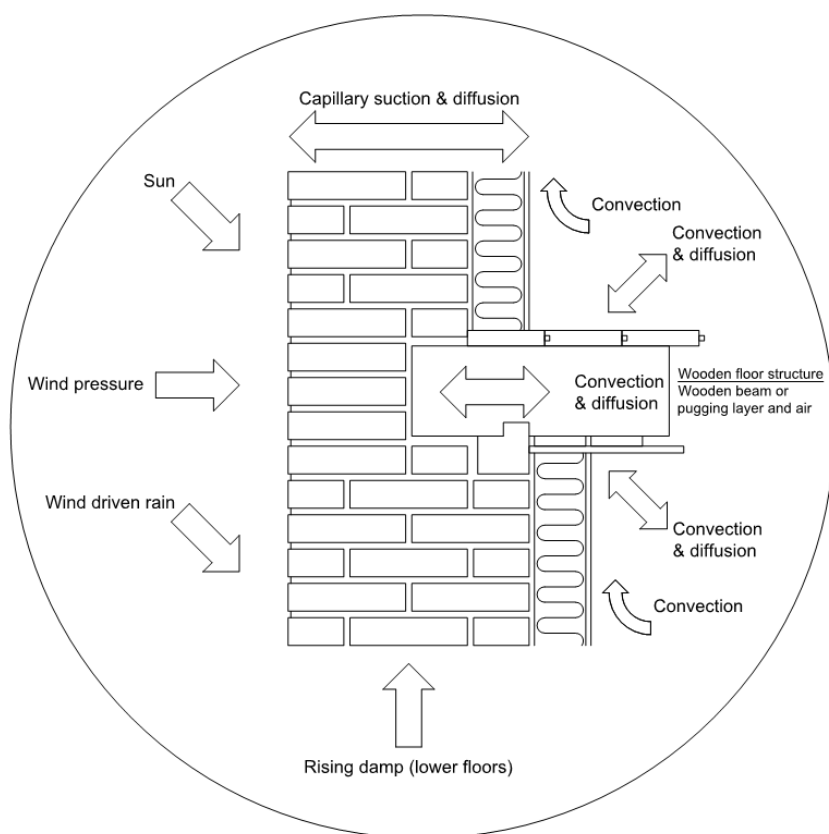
Hygrothermal processes in vertical cross-section of solid masonry column in traditional facade wall of multi-storey built in the period 1850-1930.
